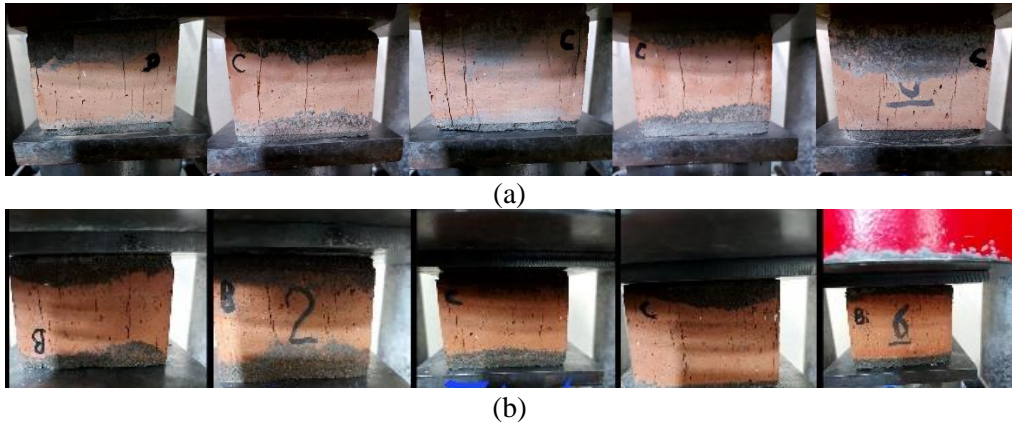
Surface cracks on cut faces of (a) dry and (b) wet specimens
